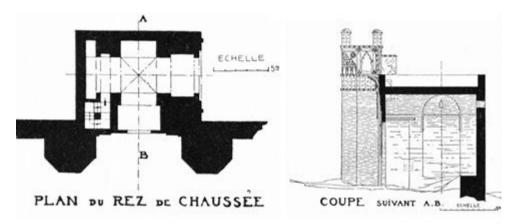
Site plan and cross section of the main gate of Šālla, built in 1339. Drawings by Jean Hainaut. De la Nézière 1922: figs. 28–29.
